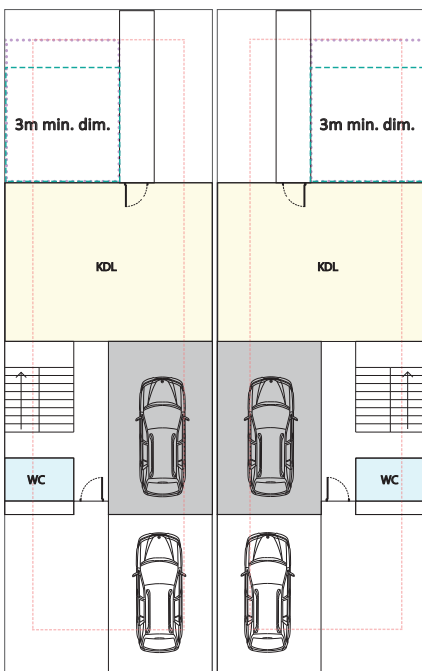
Floor plans for type TH1 - Refer fig 71,72 (page 60) for further details.
